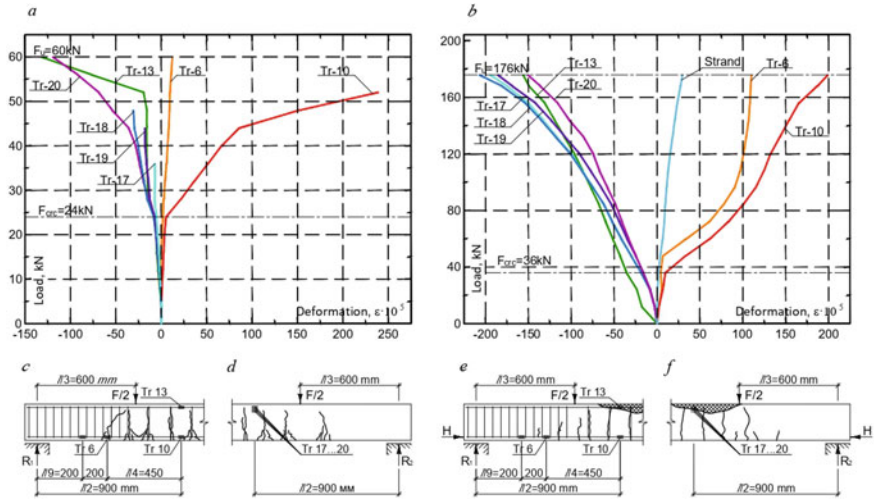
Diagrams of the development of deformations of reinforcement and concrete: a BS-1 beams under static loading, arrangement of tensoristors on reinforcement and concrete, c, d pattern of cracking; b beams BST-2 with thrust under static loading, e, f arrangement of tensoristors on reinforcement and concrete, pattern of cracking
